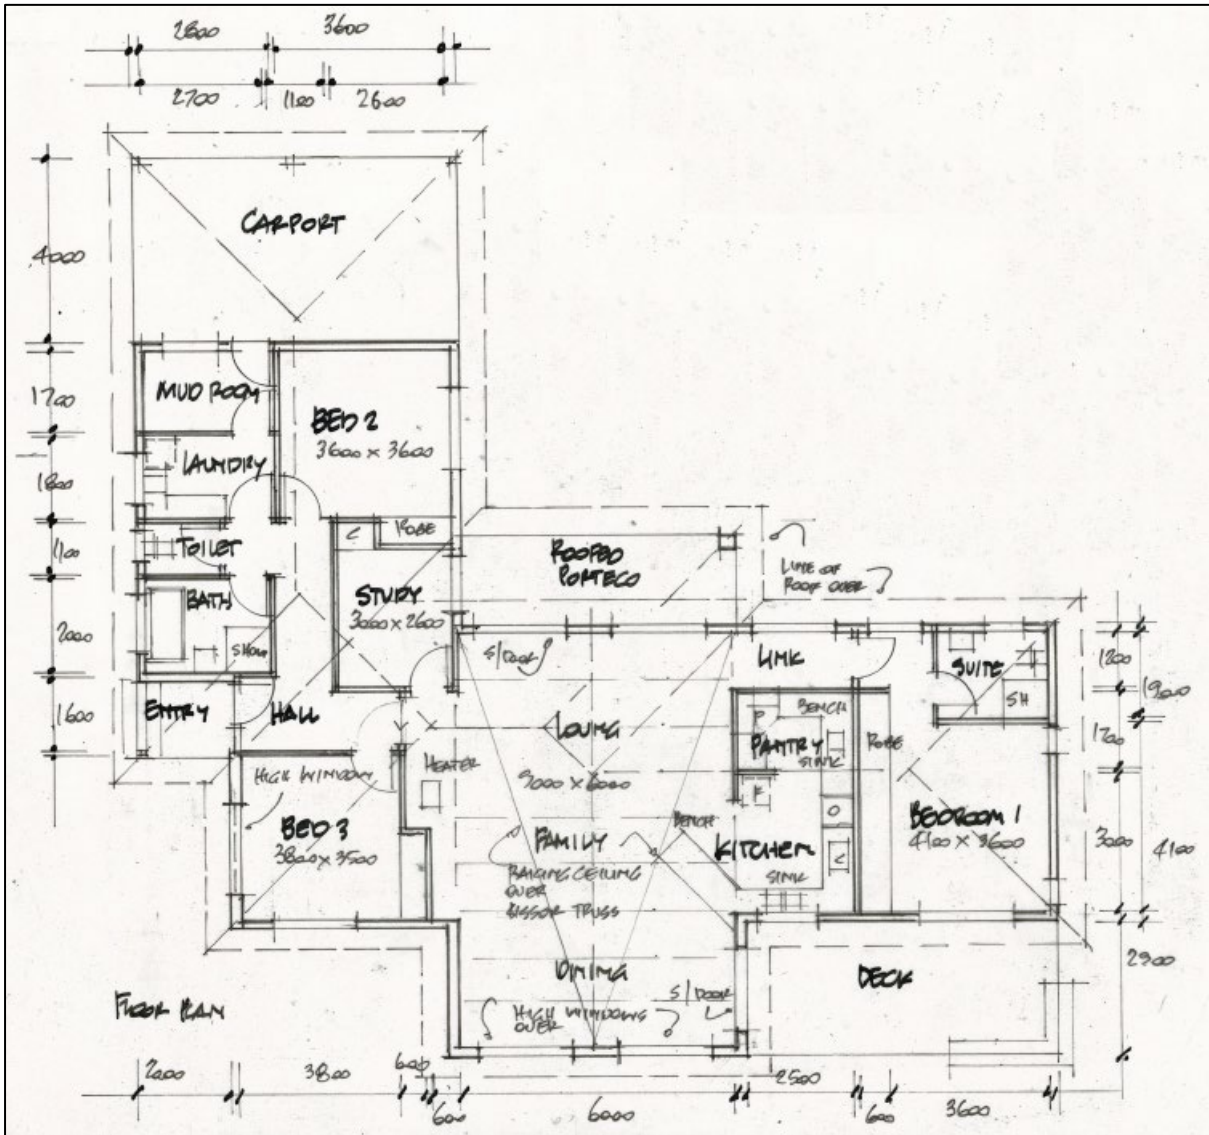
Farm dwelling floor plan (Source: Building Design Service).
